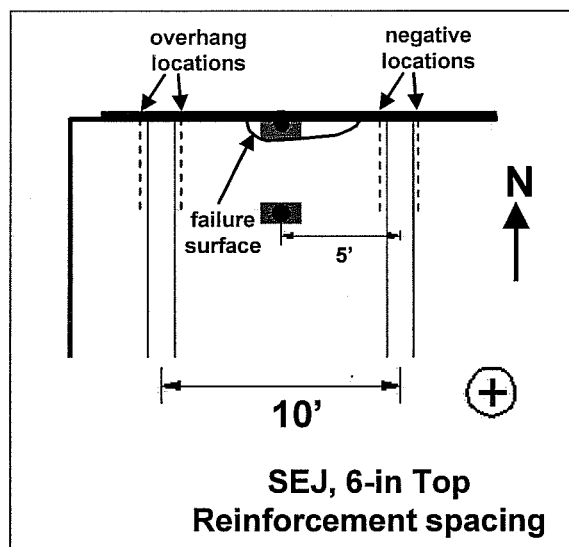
SEJ, 6 in. top reinforcement spacing, positive-moment region (Test Area 4)
